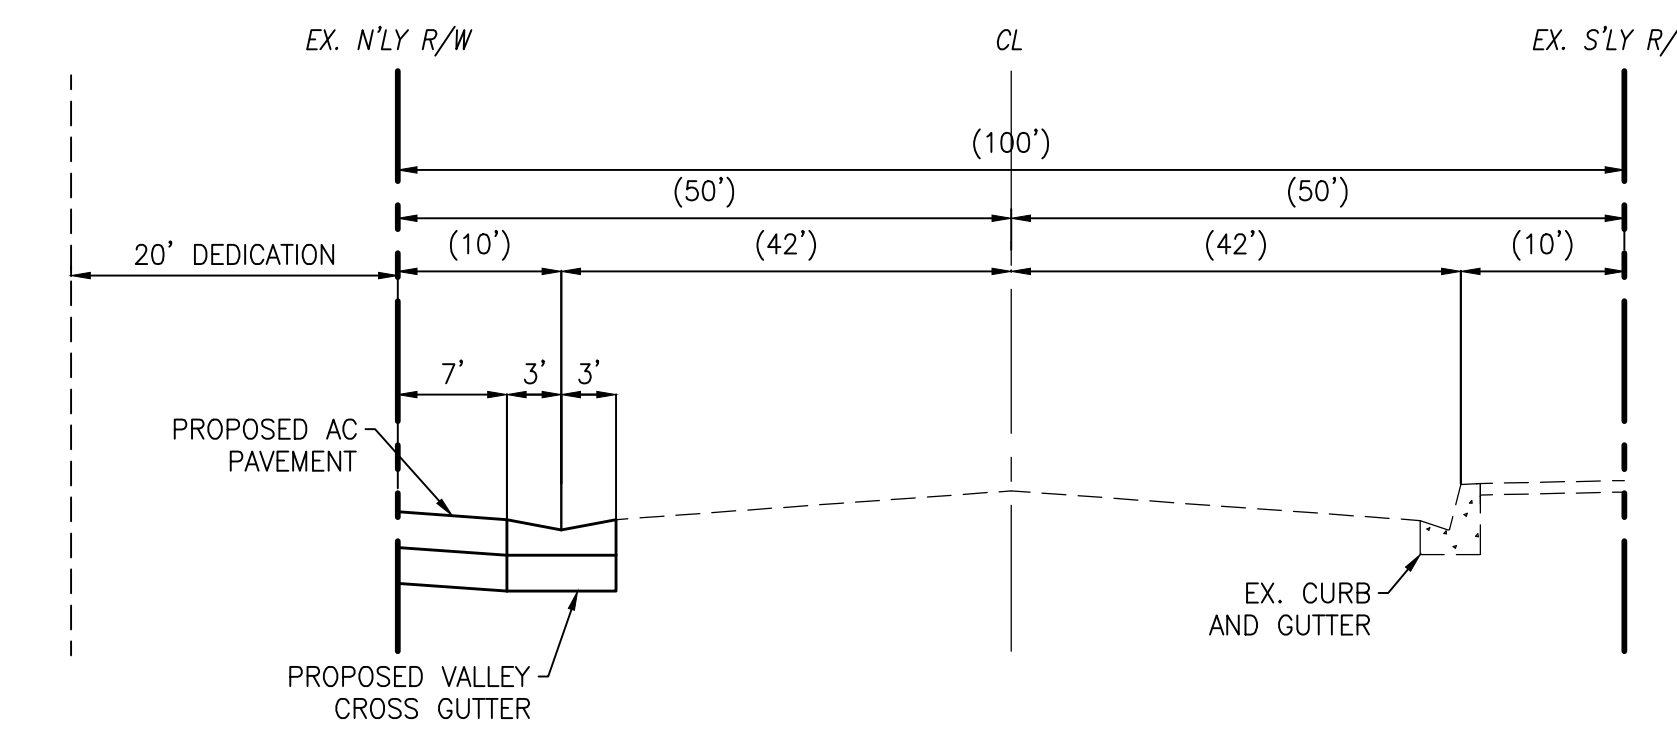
PROPOSED EAST WALNUT DRIVE PUBLIC STREET TYPICAL SECTION
